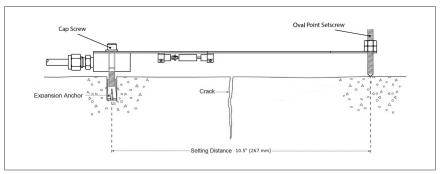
Crackmeter assembly with only one anchor and without a reference disk
